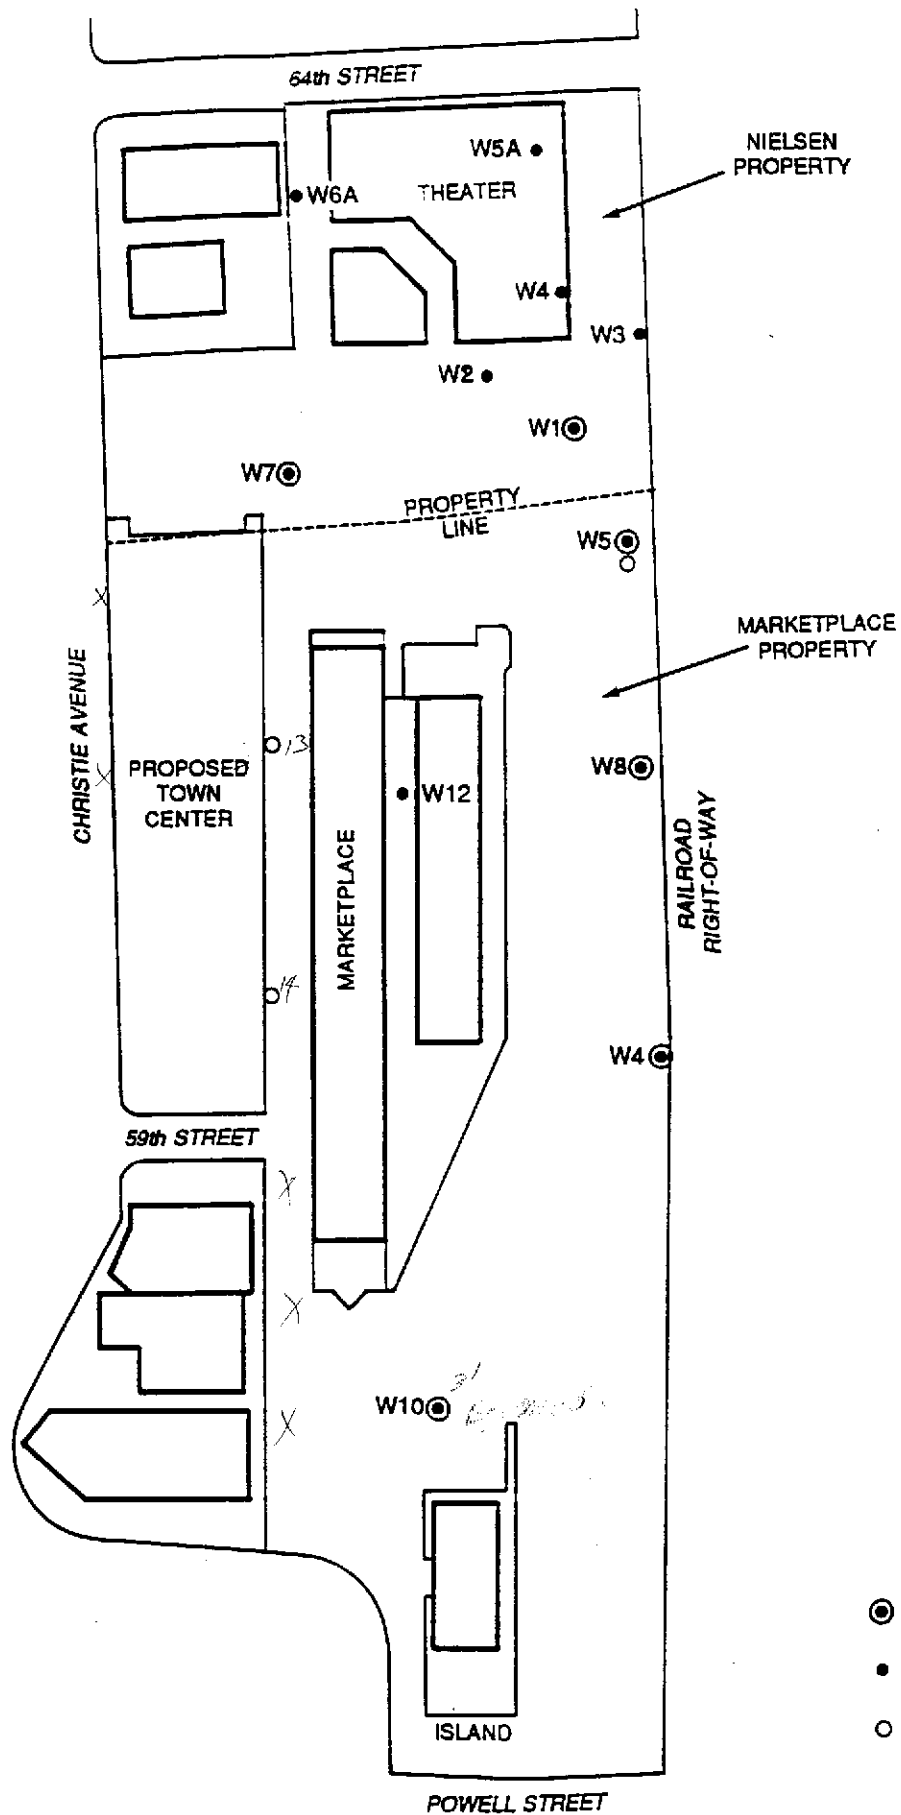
MARKETPLACE PROJECT SITE DETAILING BORING LOCATIONS
